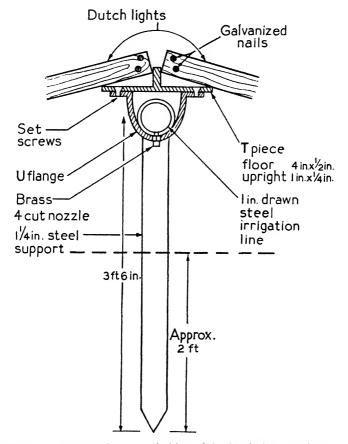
Support for central ridge of double-light span frame, fitted with irrigation line
